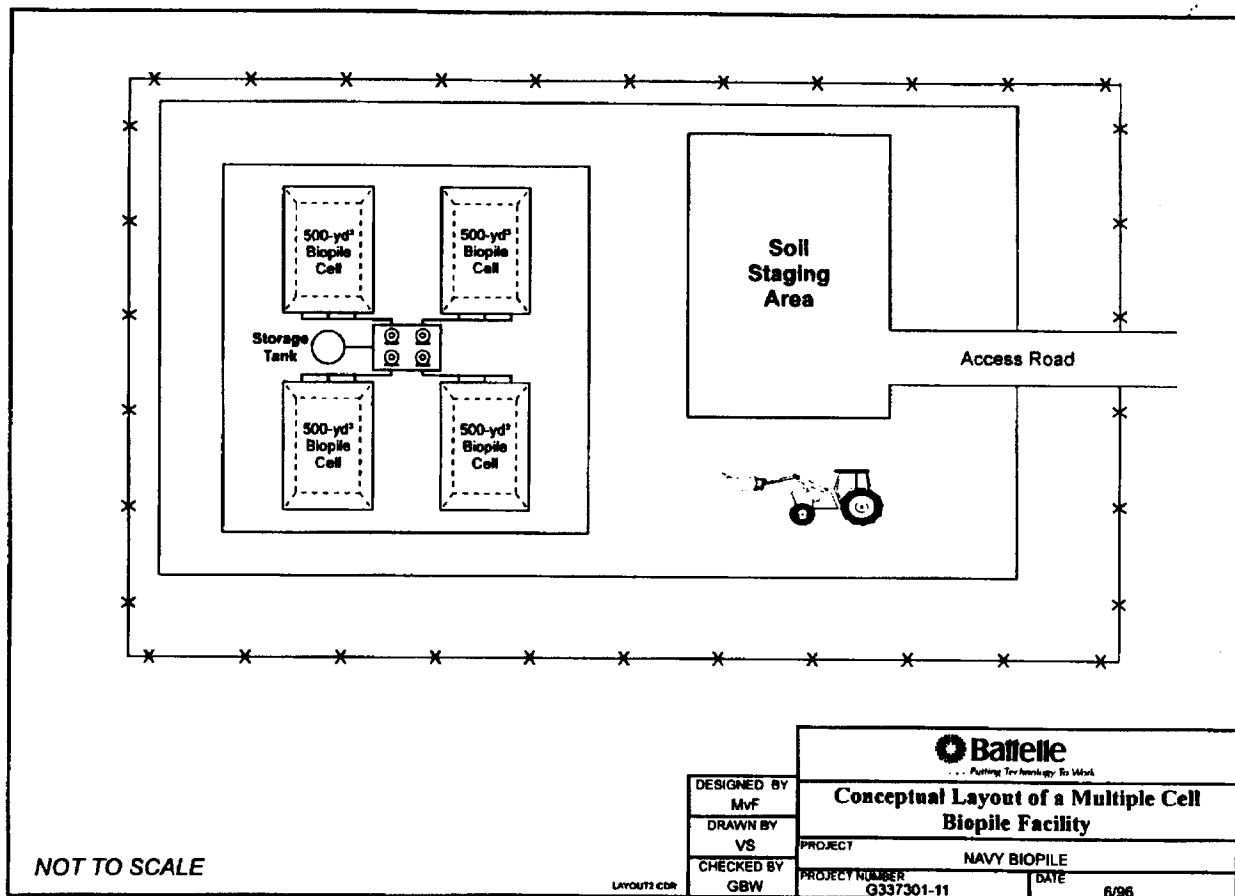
Plan View of a Site with Multiple Biopile Modules.
